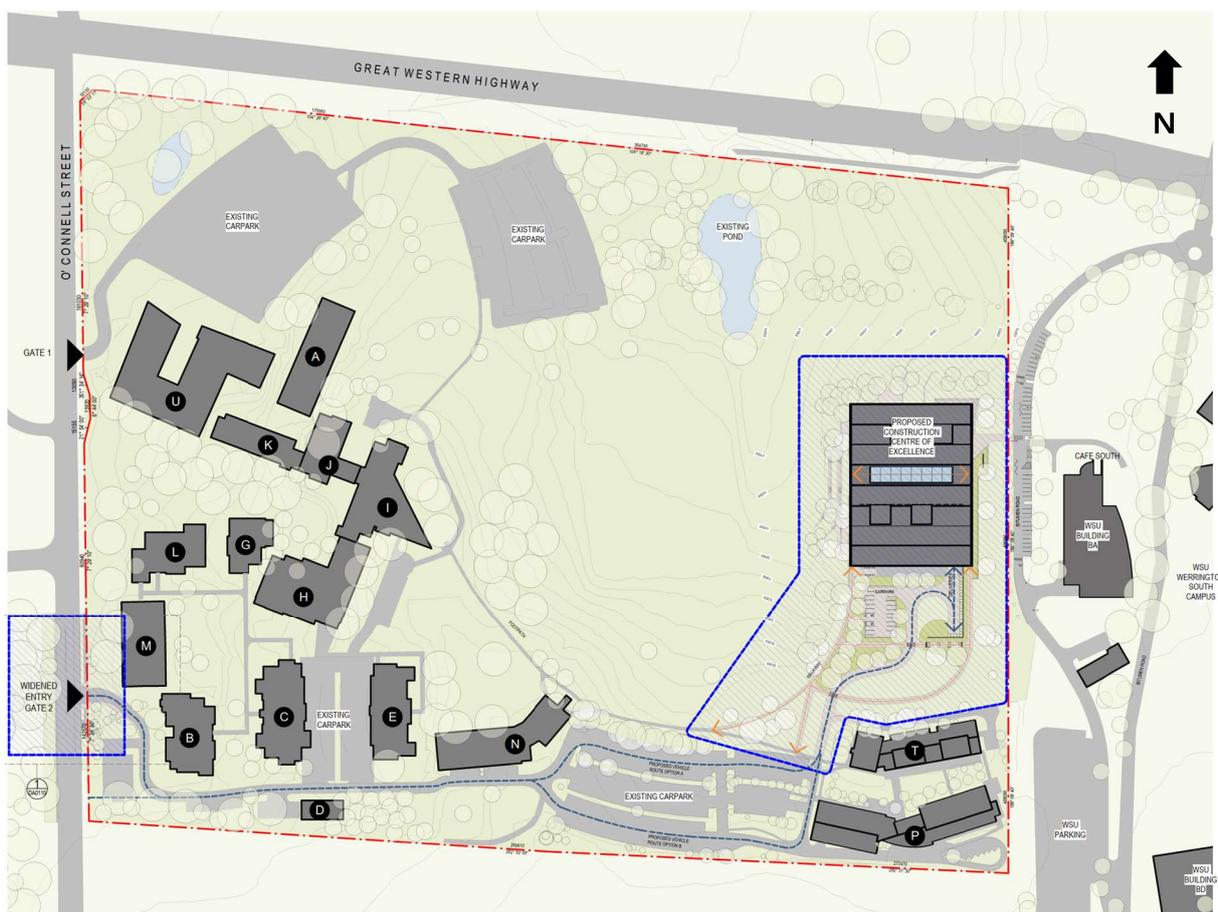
TAFE NSW IATC Proposed Site Plan (Source: Gray Puksand)
